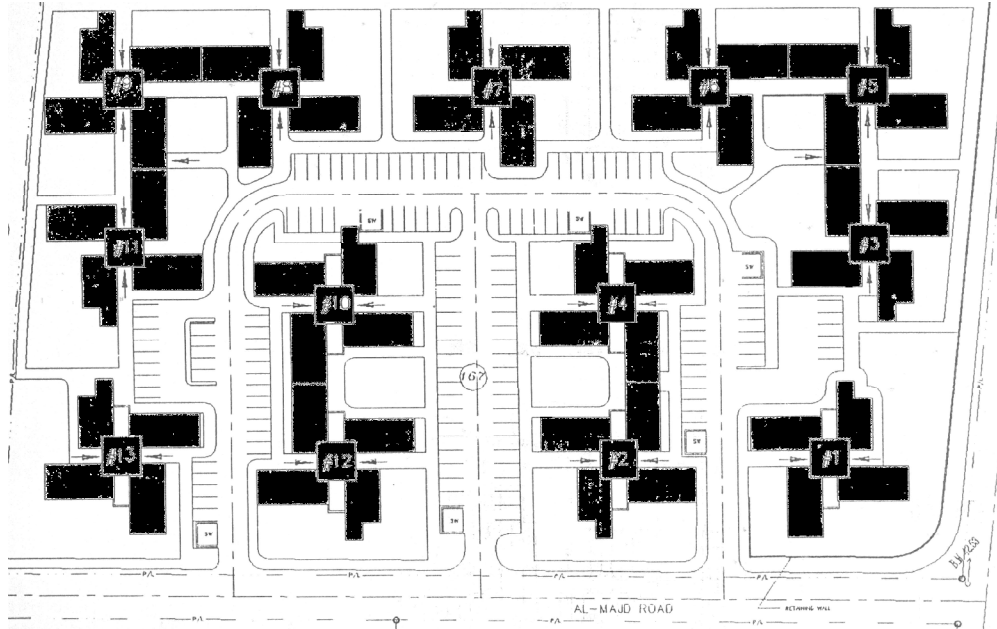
El-Karama Housing Project layout [Site layout plan - El-Karama Project]
